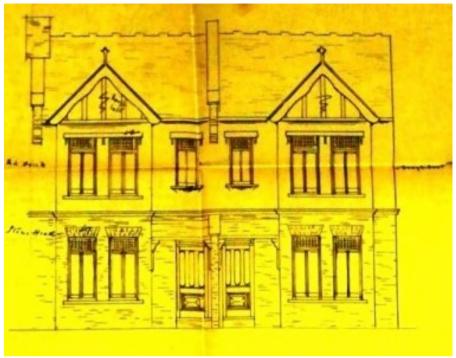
Elevation of houses in Halsmere Road. The estate agent and estate owner as arbiters of taste. The timber panelling and lintels are crossed out to indicate that they are not approved by the freeholder. This removal of external timber may have been because of the London Building Acts (Ibid., IV/86/1/5/29).
